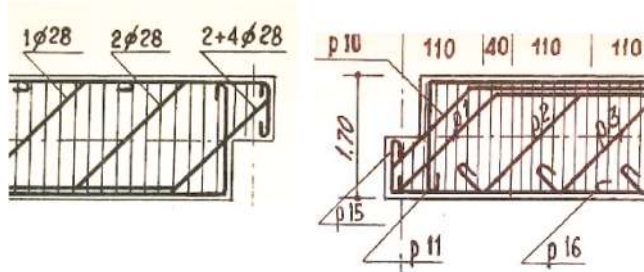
Examples of reinforcement layouts in dapped-end beams of existing Italian bridges [42].
